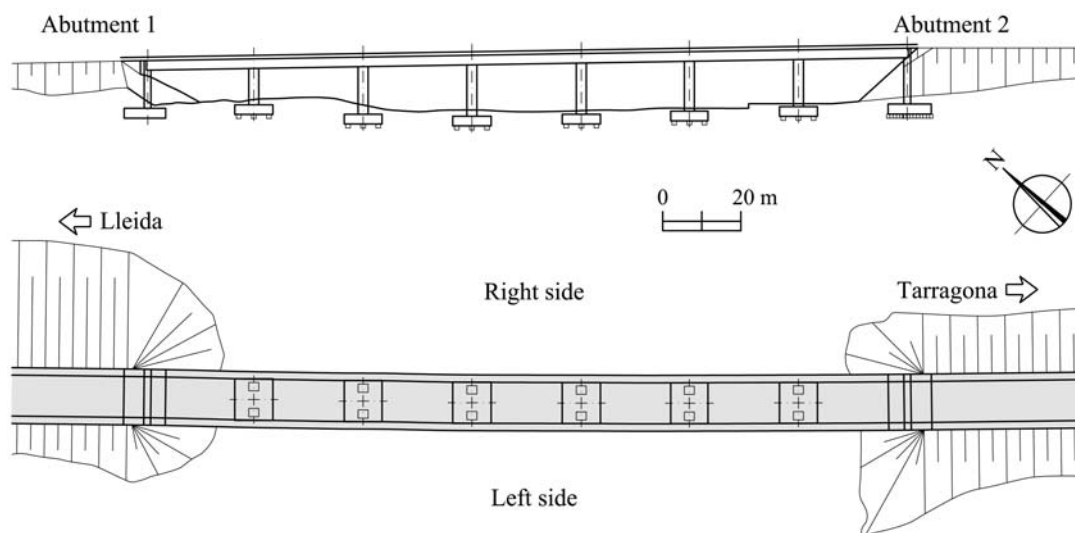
Longitudinal profile and plan view of Pallaresos Bridge and embankments
